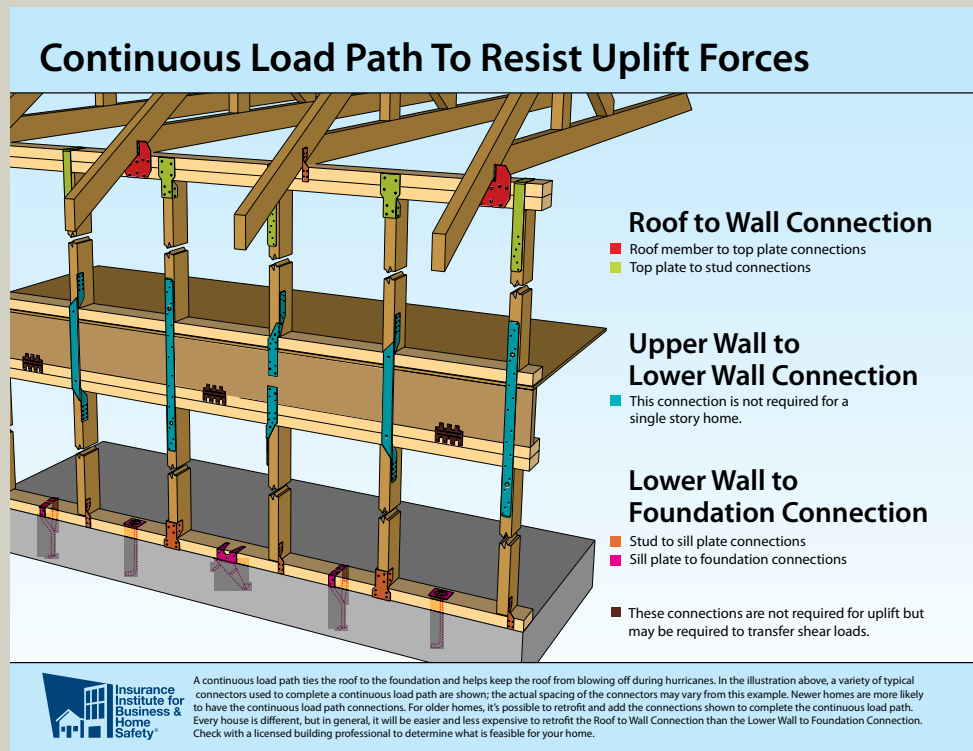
Continuous load path connection ties: the roof to wall, usually with hurricane clips and plate ties; the wall of a higher story to the wall of a lower story with straps; and the wall to the foundation with plate ties and anchors. Continuous load path connection ties should be in all new houses. Older homes usually will not have these features. In many cases, retrofit can easily be done for certain portions. Source: Simpson Strong-Tie.
